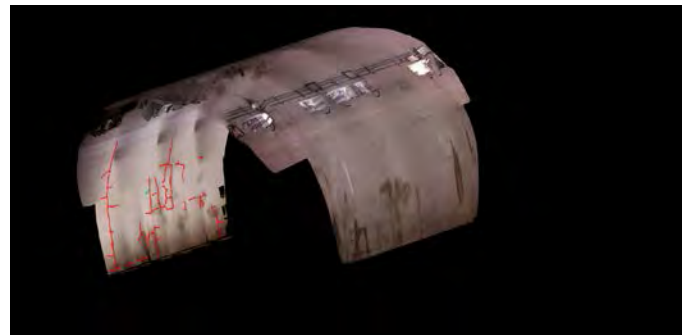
Overall view of tunnel stretch by southern portal with digitized cracks on left wall.
